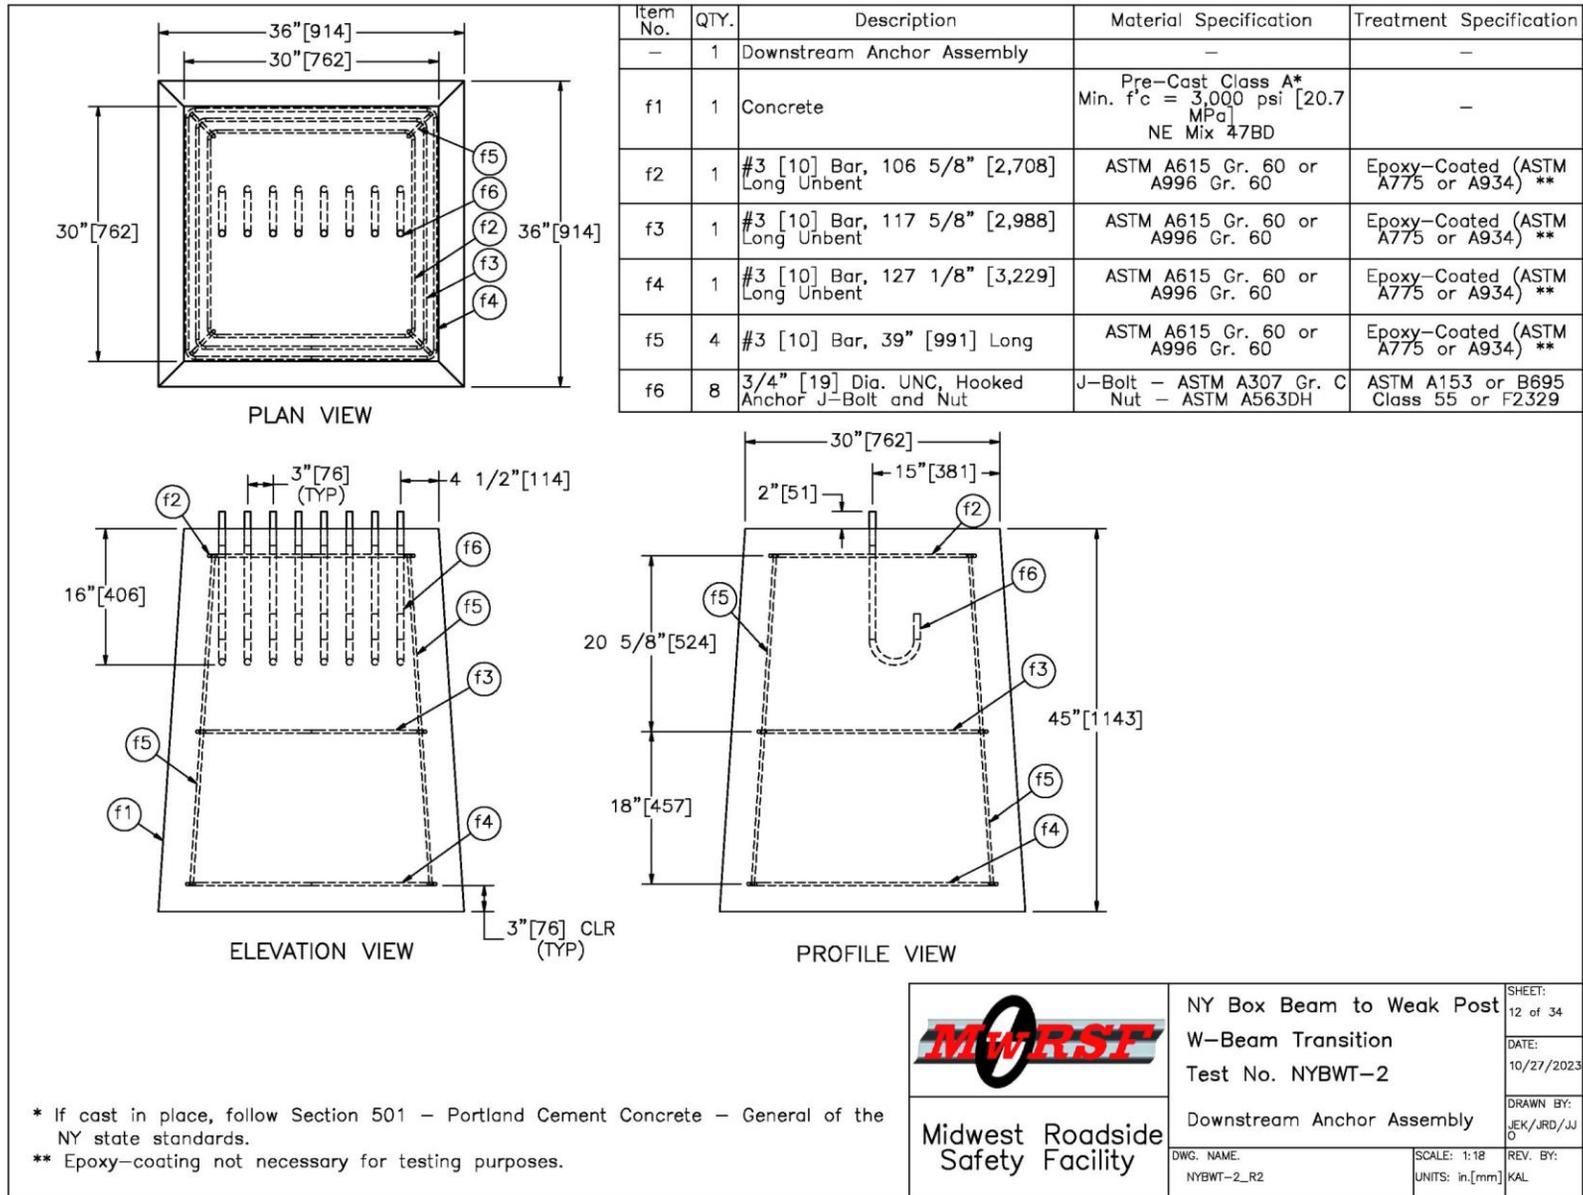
Downstream Anchor Assembly, Test No. NYBWT-2
